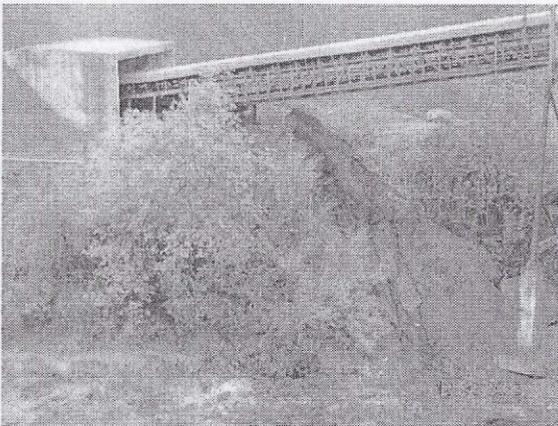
Photo of coal spillage under the conveyor project adjacent to river Sonadubi
